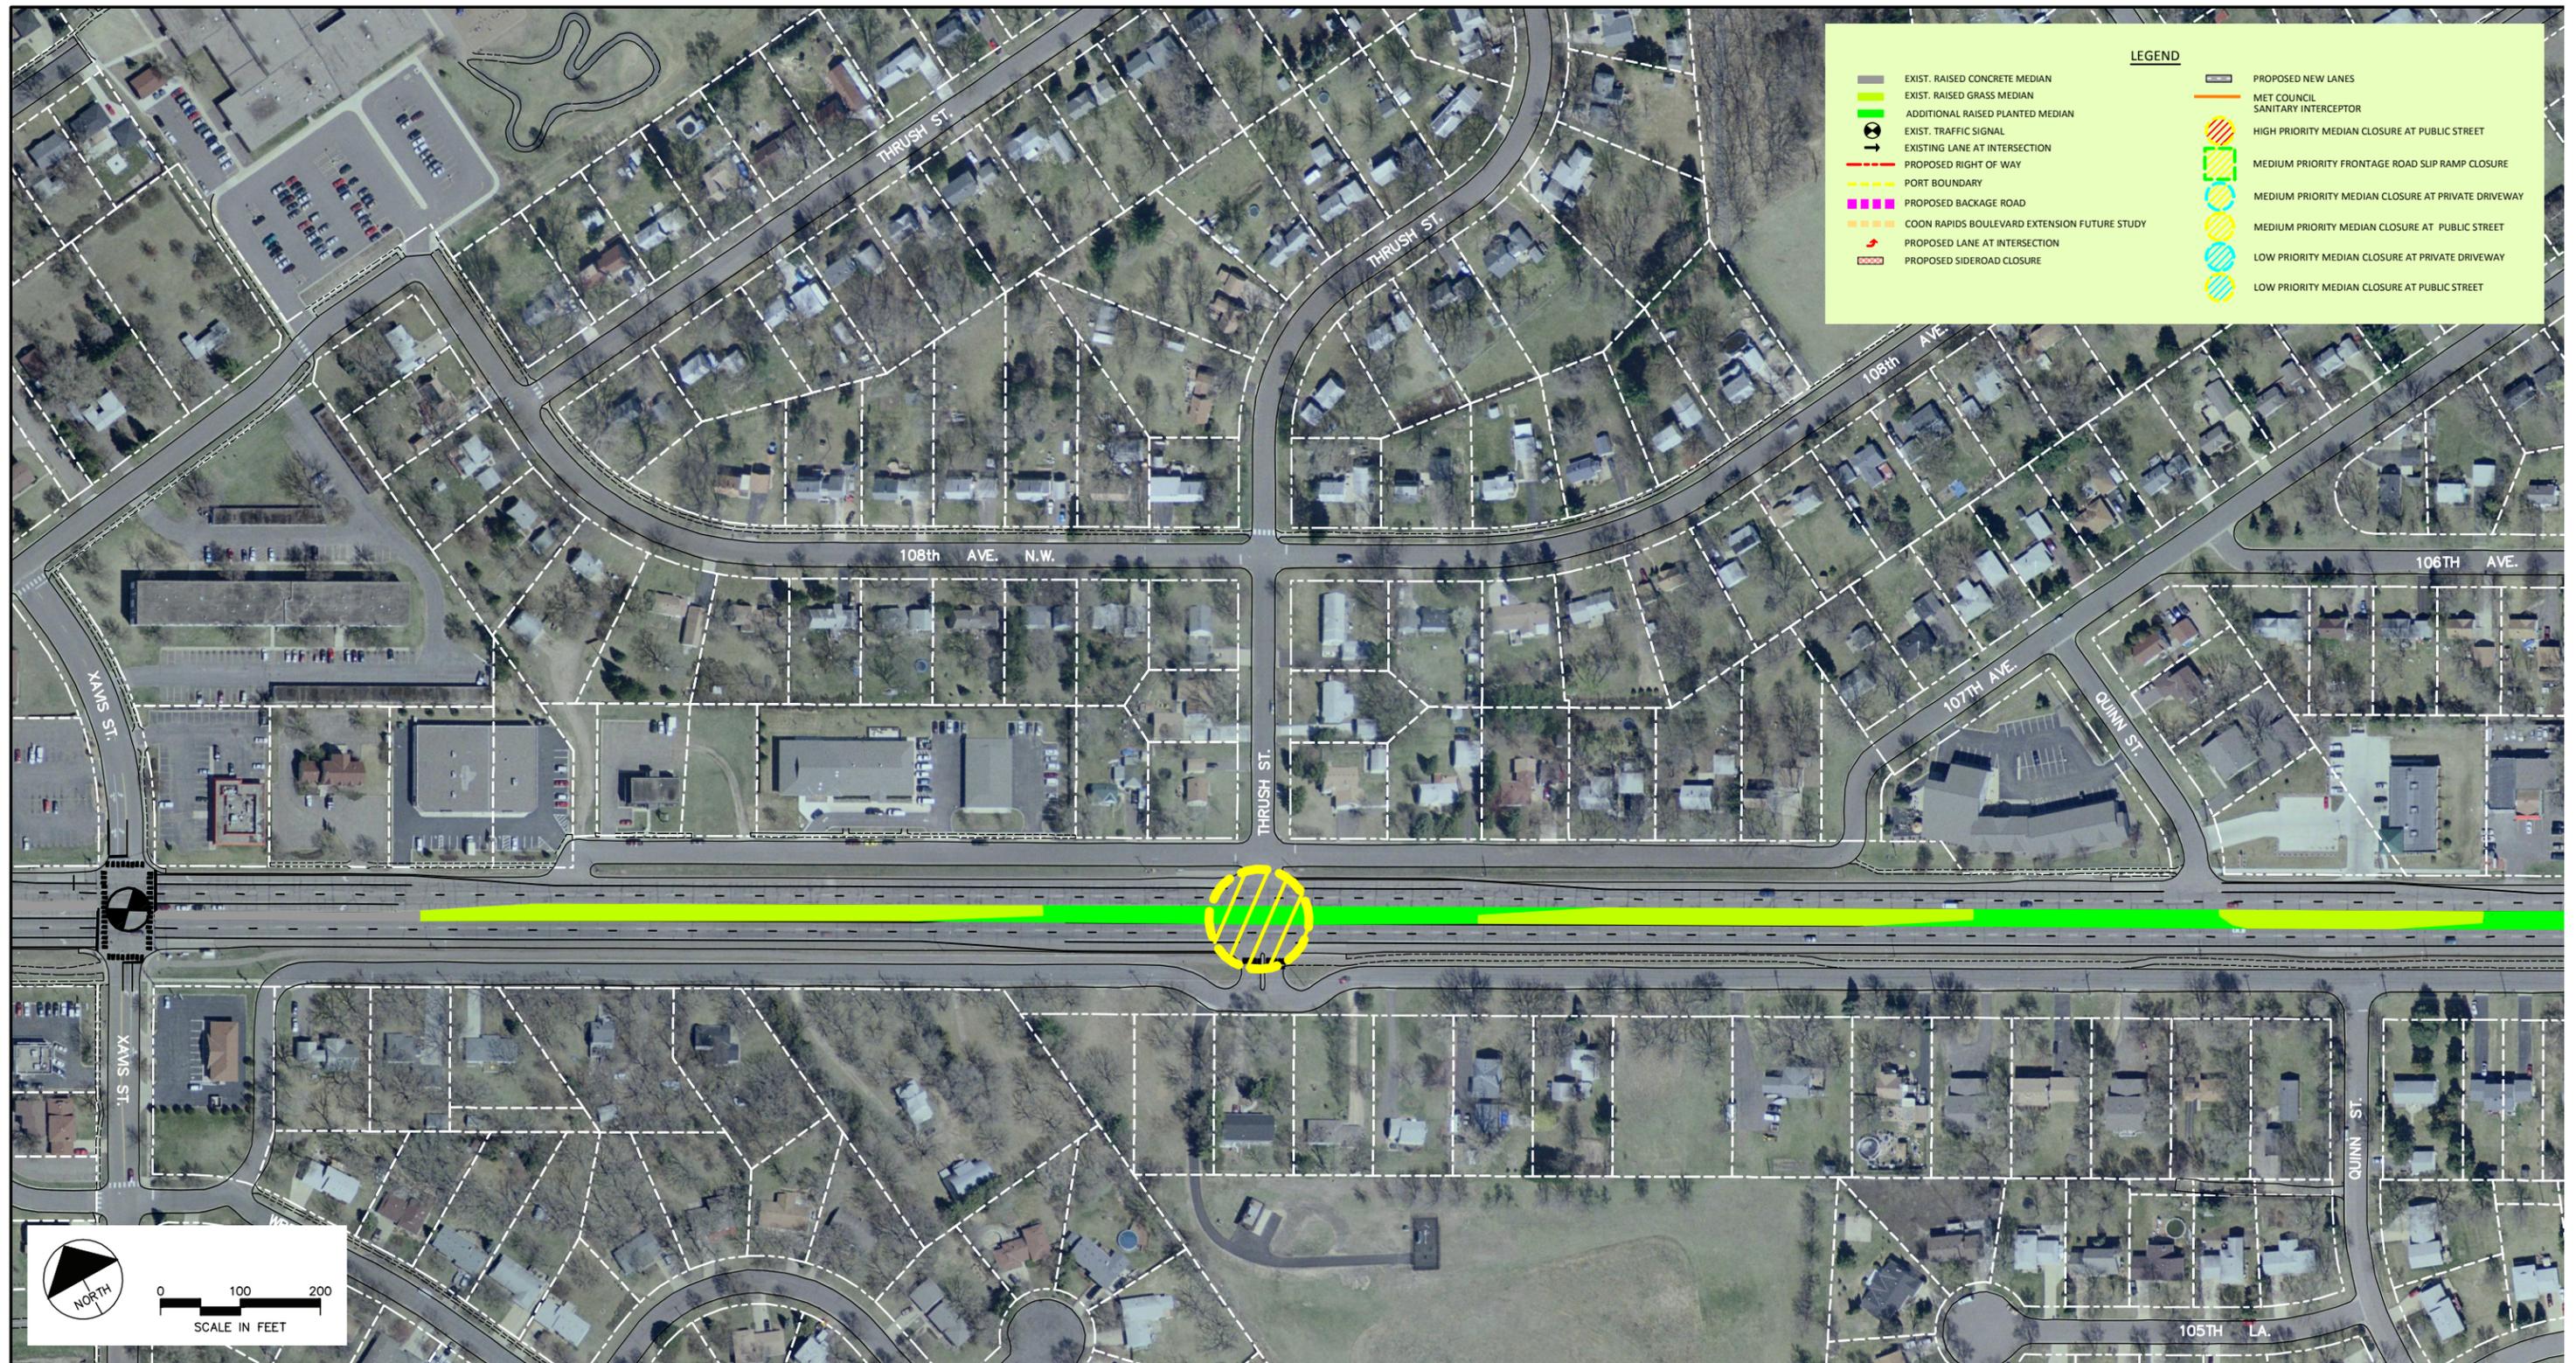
Proposed Roadway Recommendations Detail (7 of 15)
